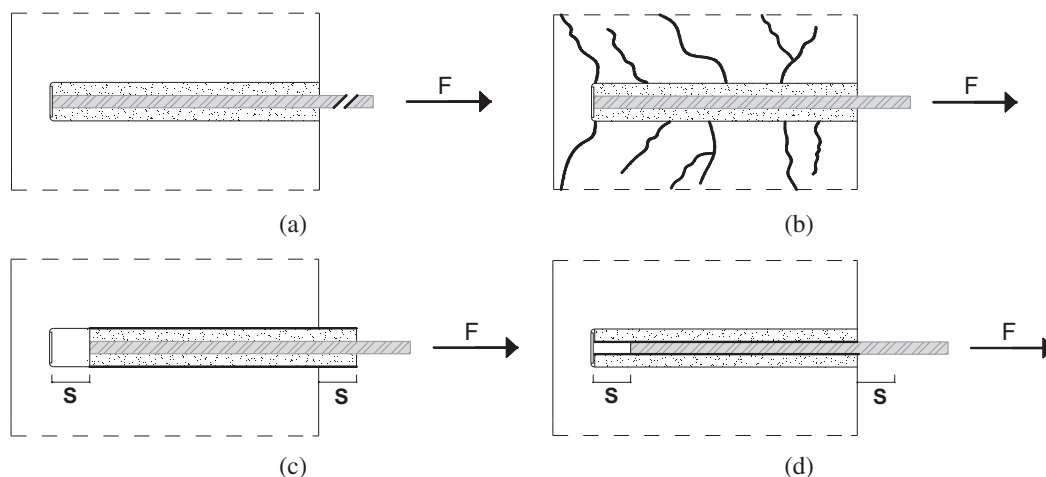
Possible failure mechanisms in anchoring systems: (a) steel failure; (b) masonry cone failure; (c) sliding failure along the outer interface; (d) sliding failure along the inner interface.
